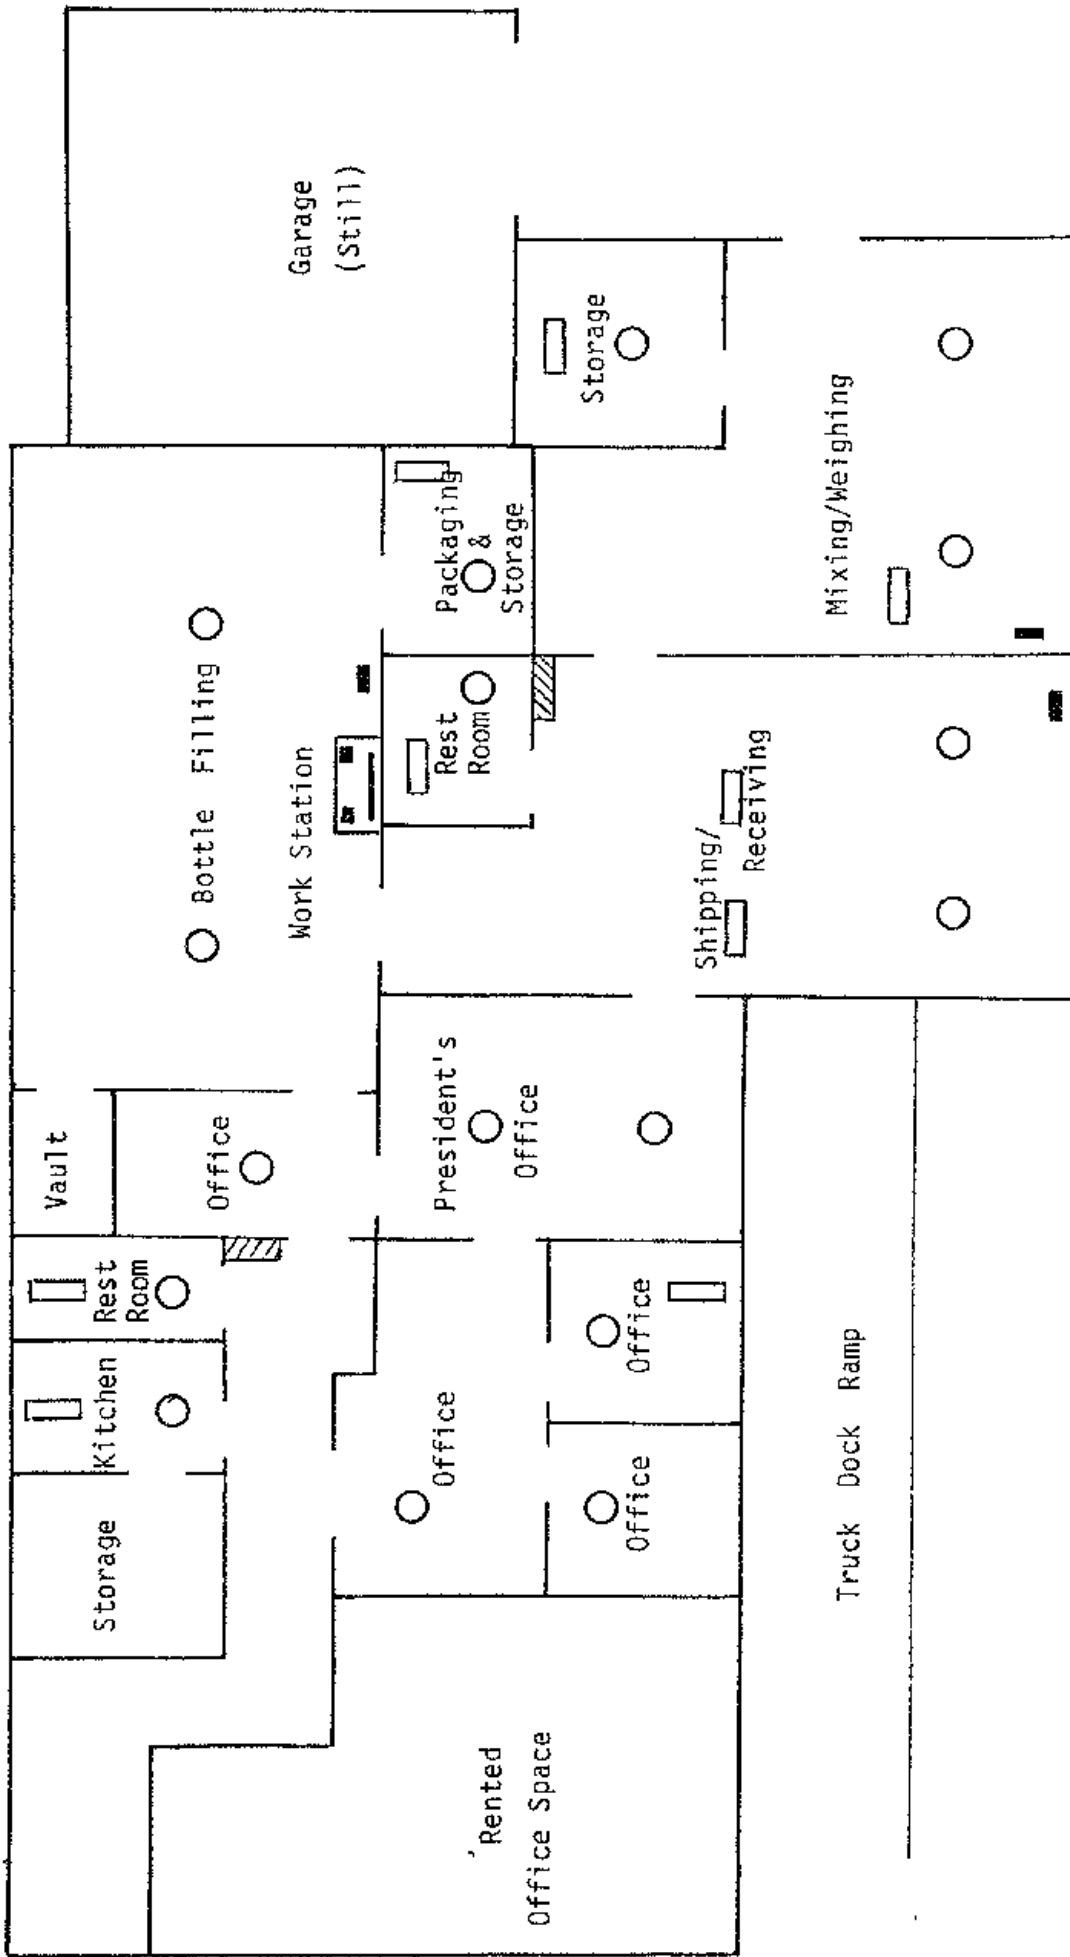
Plant Lay-out Showing Approximate Locations of Ventilation Openings
